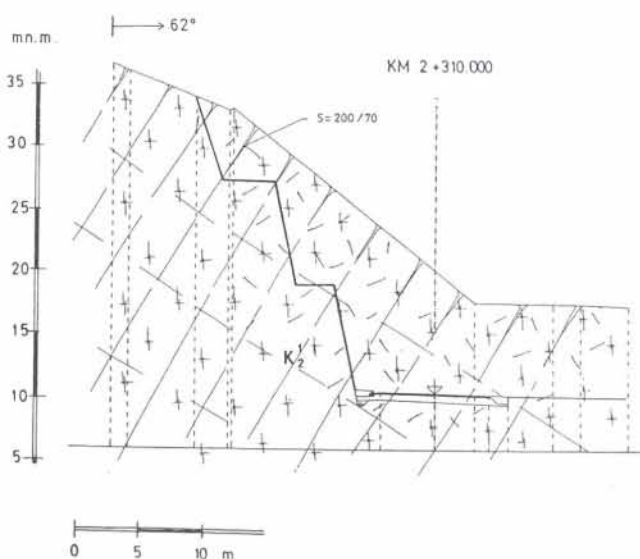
Cross-section at the location of planned bridge over Crna rijeka River
